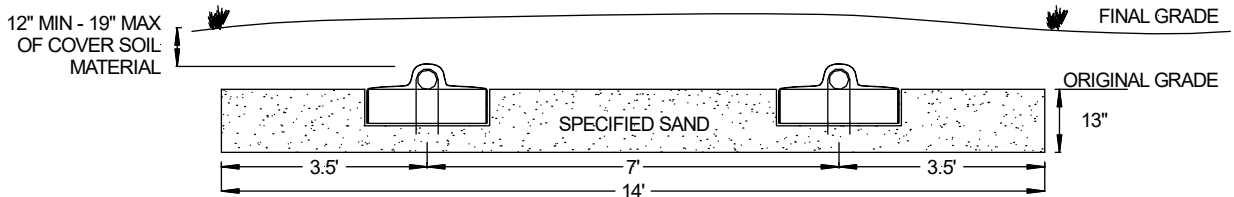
CROSS SECTION VIEW – 600 GPD – A42 – BED SYSTEM – LEVEL SITE
